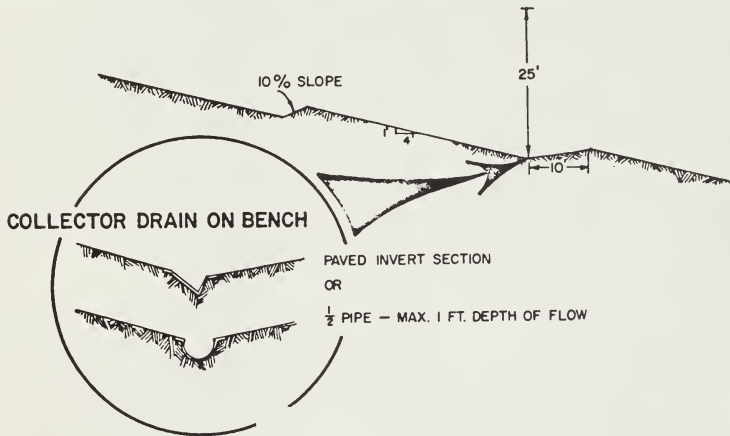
TYPICAL SLOPE SECTION OF PROCESSED SHALE PILE
